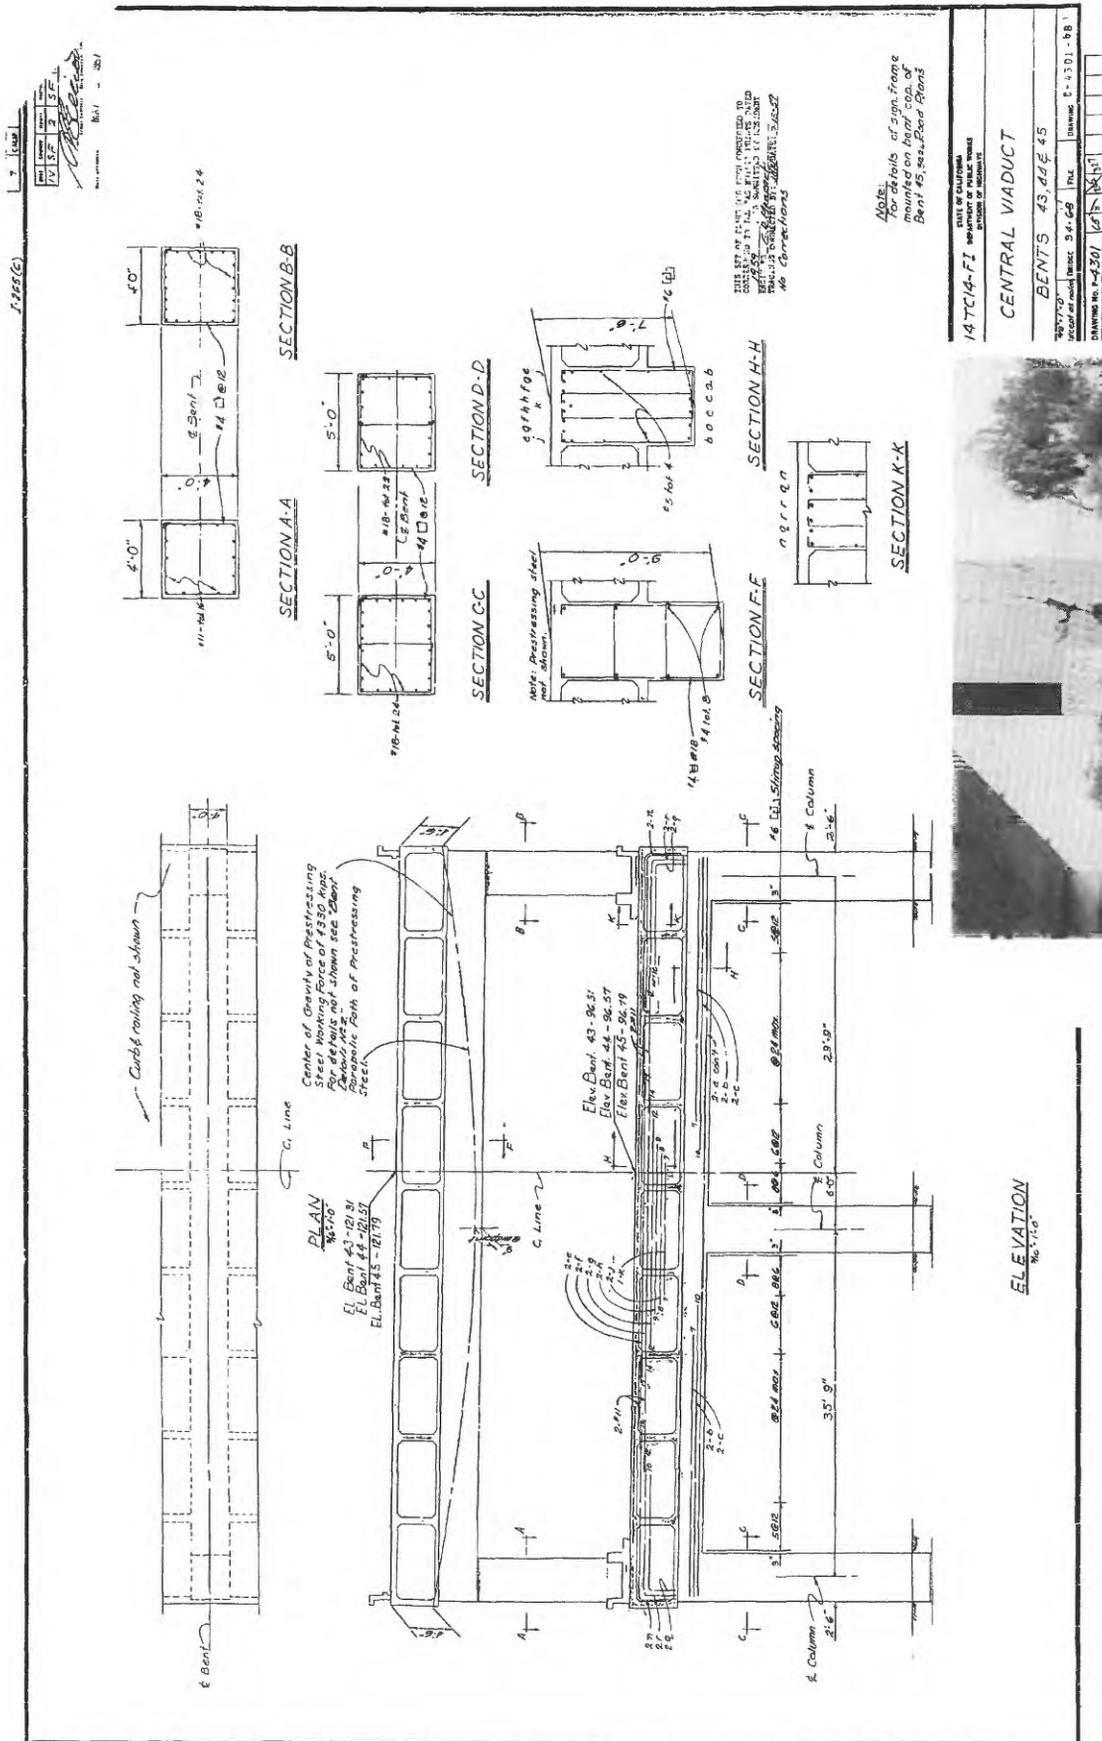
Elevation drawing of Bent 43 at Central Freeway Viaduct.
